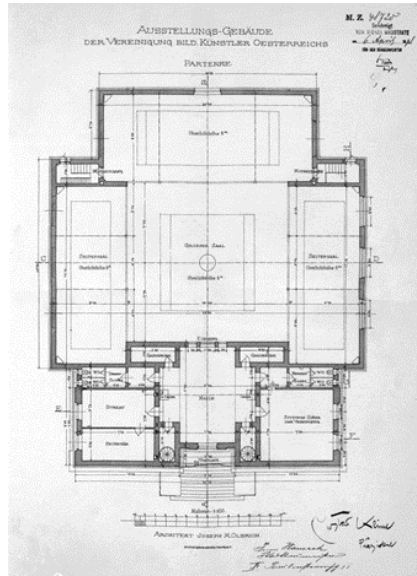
Plan of the Secession Museum (Source: Secession, n.d.)
